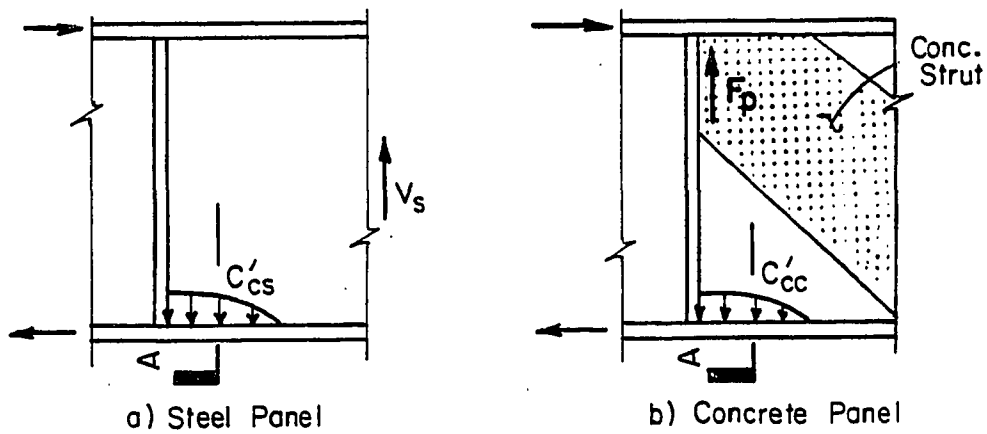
Assignment of force C_c' to steel and concrete panels.
